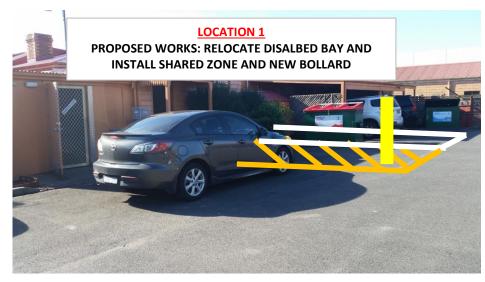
Loch Street South Car Park & Hanns Lane North East Car Park
